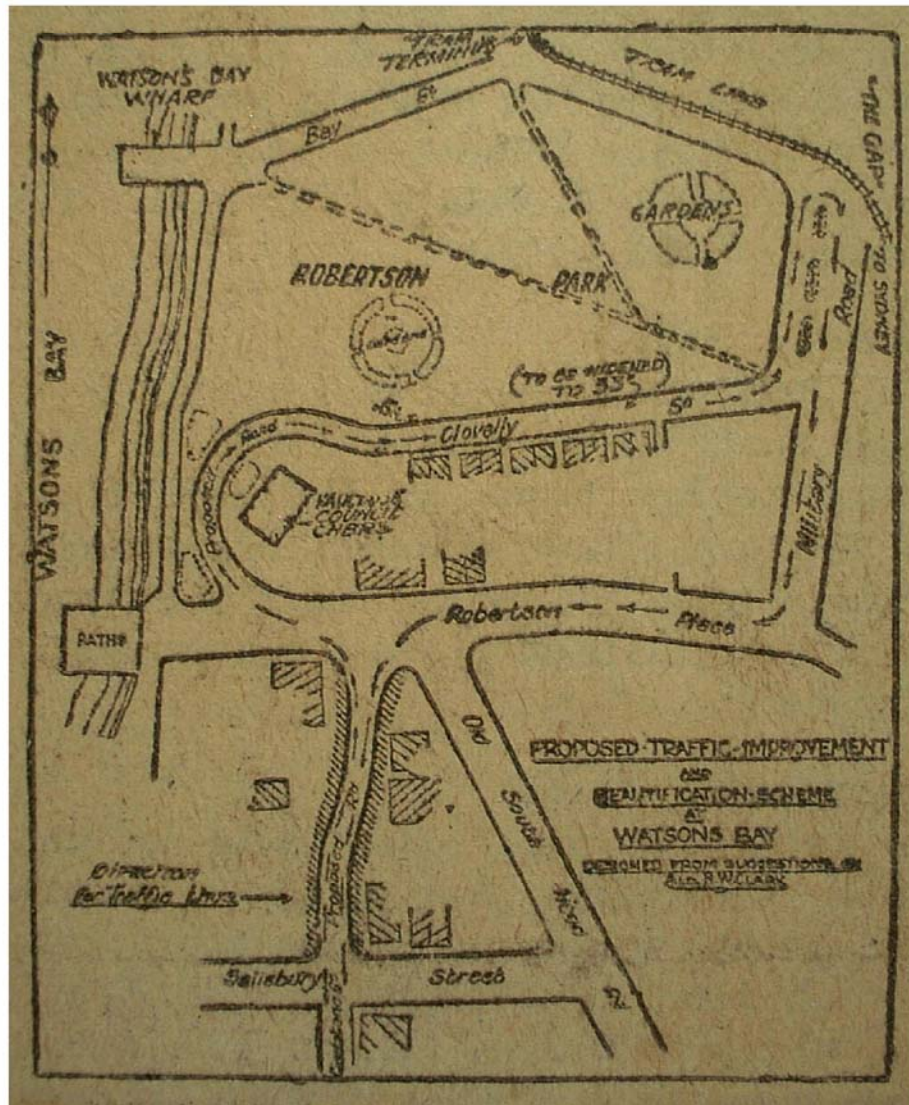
A 1926 traffic improvement and beautification scheme around *Dunbar House*, the first plan to propose a formalisation of the accessway in front of the marine villa. The present link road across the front of the building between Robertson Place and Clovelly Road was built based on this plan.
